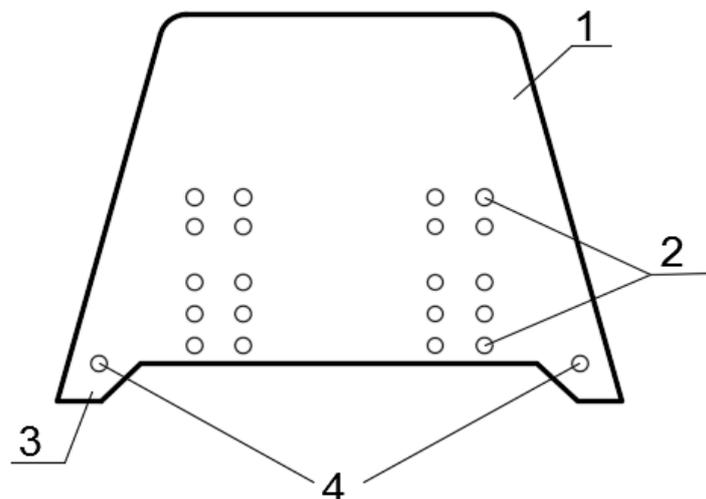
Reinforced concrete sleeper with a ribbed support part.
